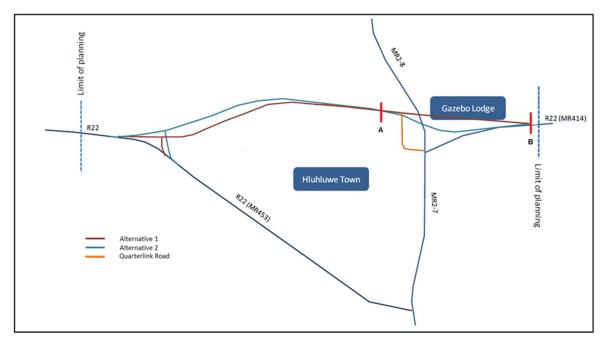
The two site alternatives proposed for the R22 road-over-rail application.
